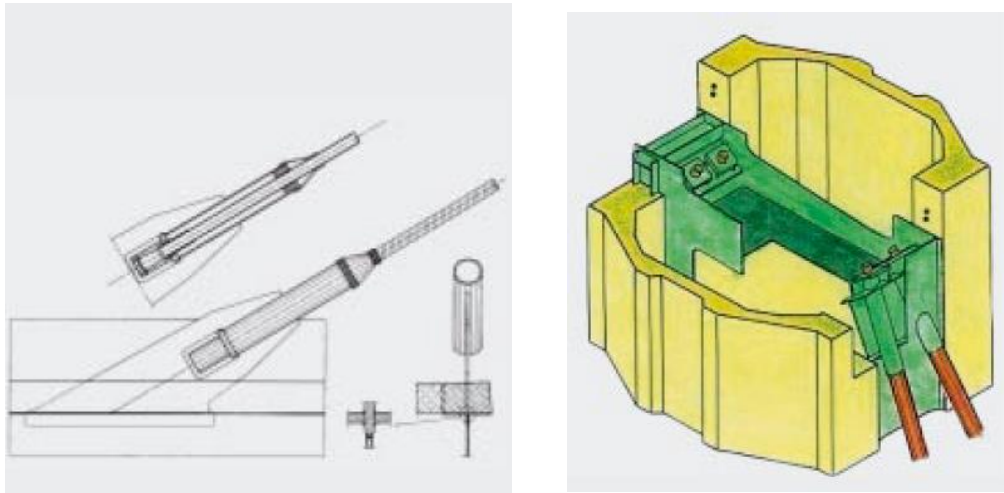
Anchorage of Steel Beam by Web Extension and Anchorage of Cable to Pylon with Steel Beam (Svensson, 2012)
